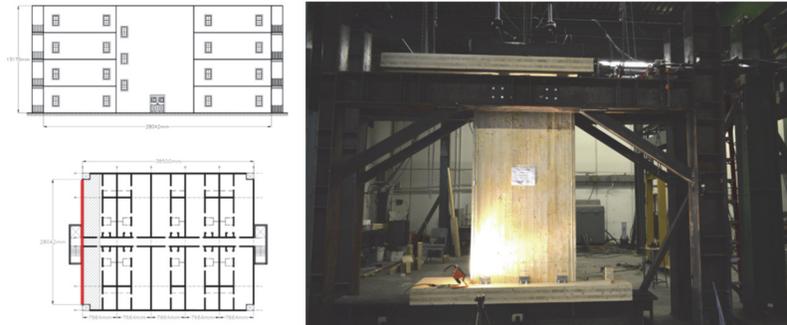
CLT archetype building elevation and plan (left) and shear wall test setup (right).
